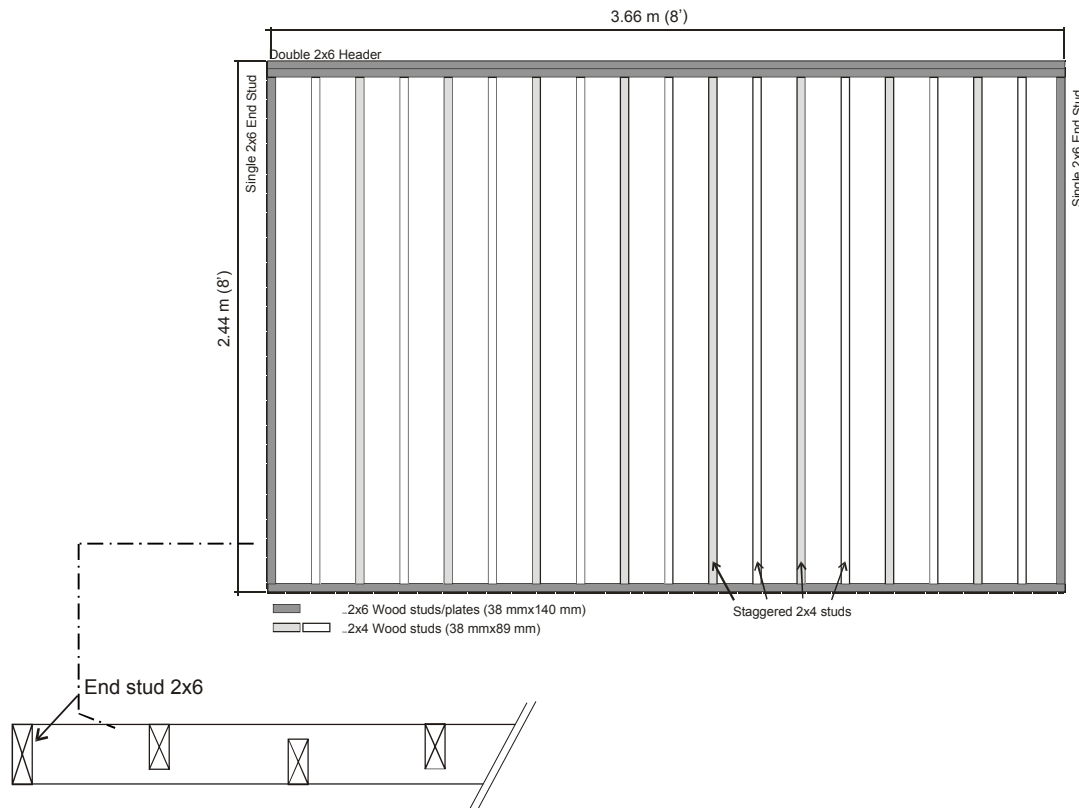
3: Framing details 2x4 staggered stud wall with studs spaced 400 mm on centre with 2x6 end studs
